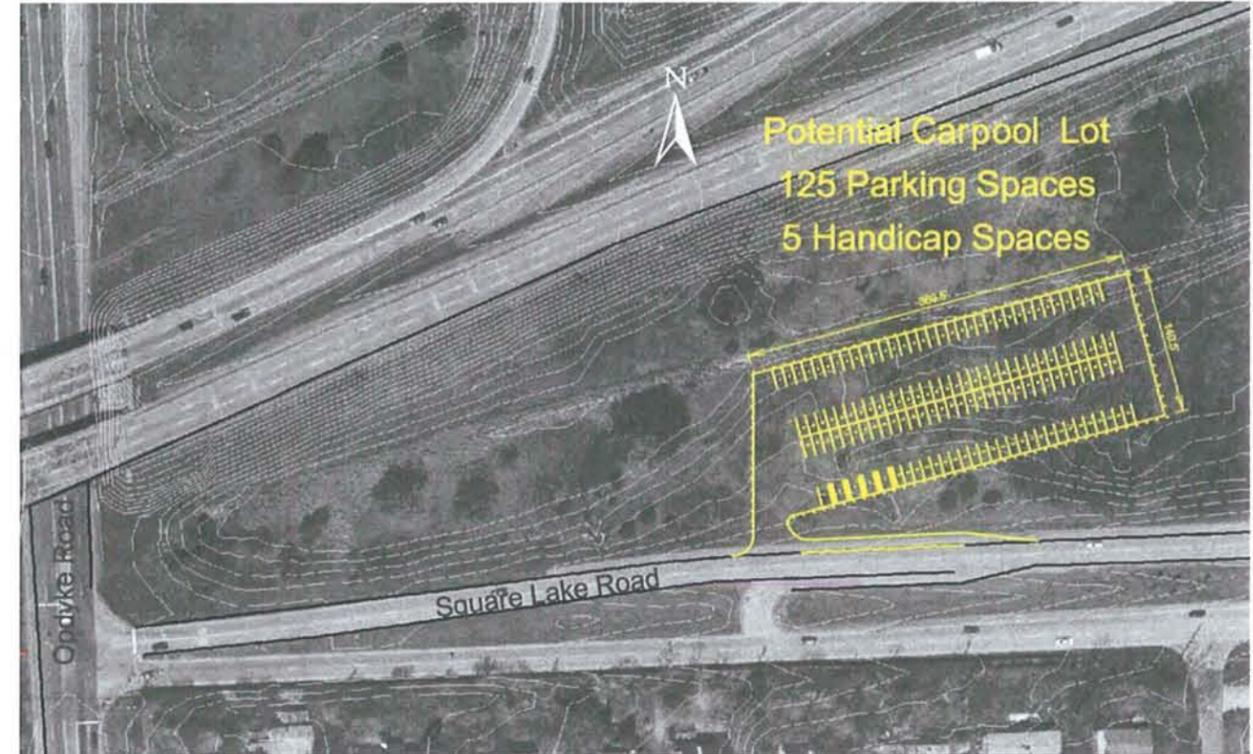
Conceptual Lot Layout of I-75/Square Lake Road East of South Opdyke Road
